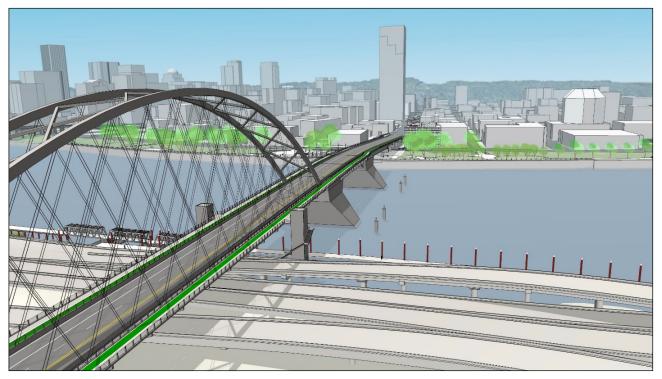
Span Combination 1 (girder west approach, bascule central span, tied arch east approach), artist's rendering, view looking southwest (Fat Pencil Studio, 2021).
